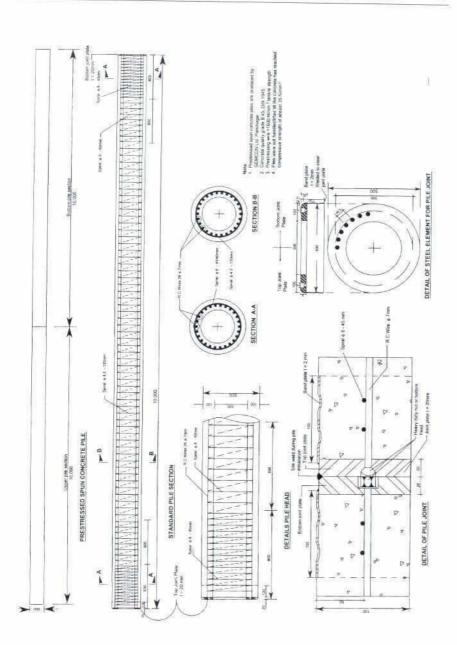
Typical design for a pre-stressed spun concrete pile section
